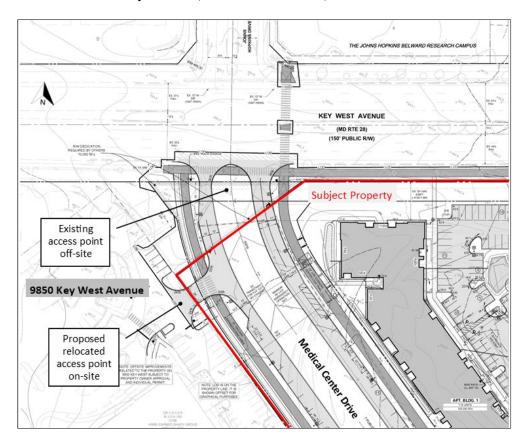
Proposed Reconfiguration of the Driveway Access to 9850 Key West Avenue
